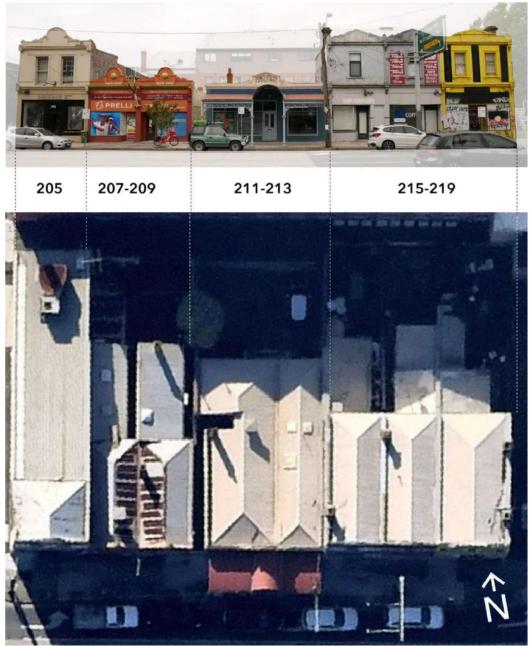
Victoria Parade elevations and aerial photograph (aerial photograph source: Nearmap)
